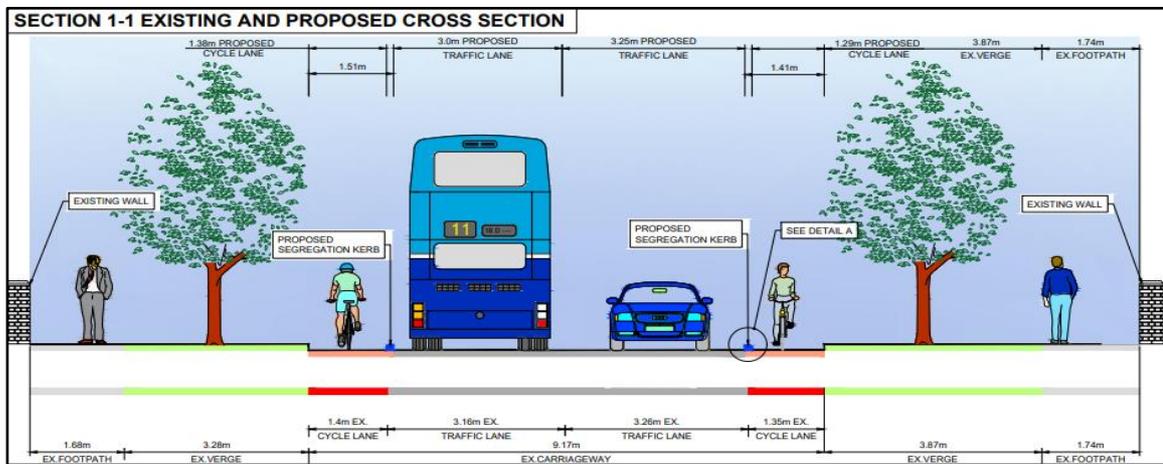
Extract from Goatstown Road Protected Cycle Lanes Sheet 1 of 5 Showing the Existing and Proposed Cross Section along the Goatstown Road
